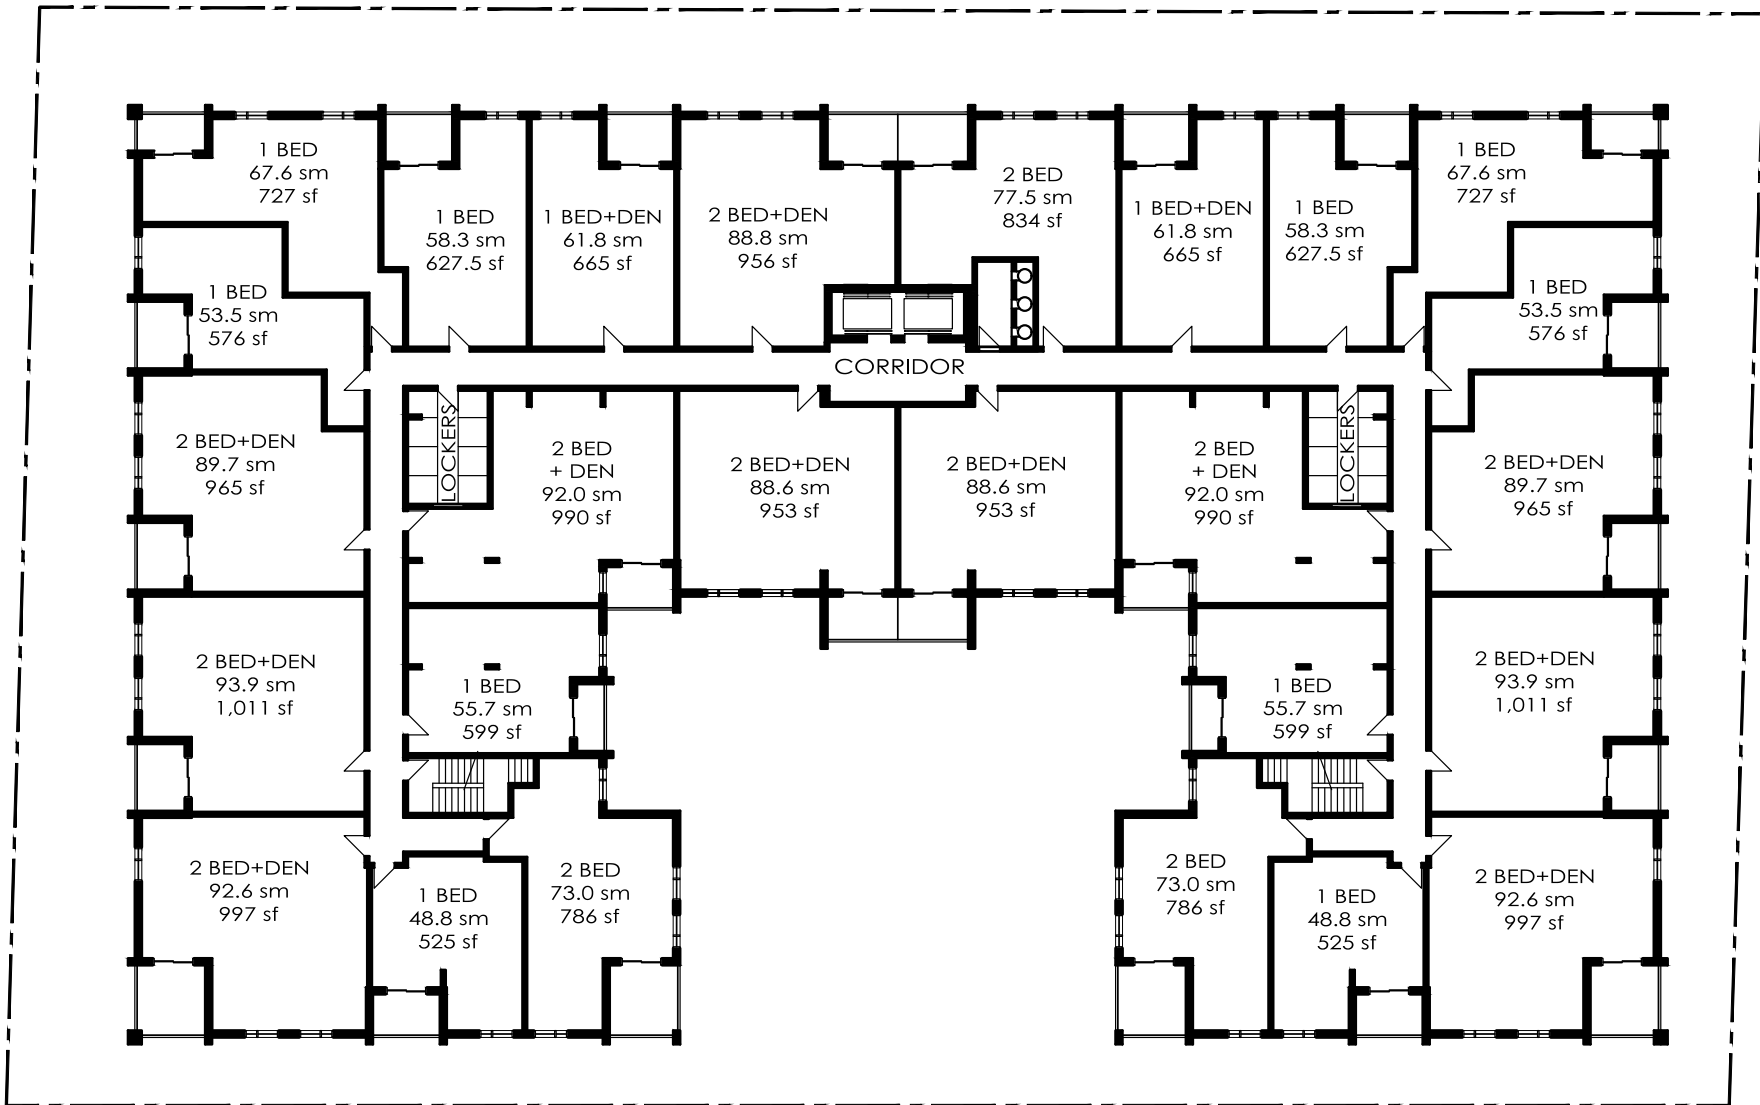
Third Floor Plan prepared by Lintack Architects Inc.
